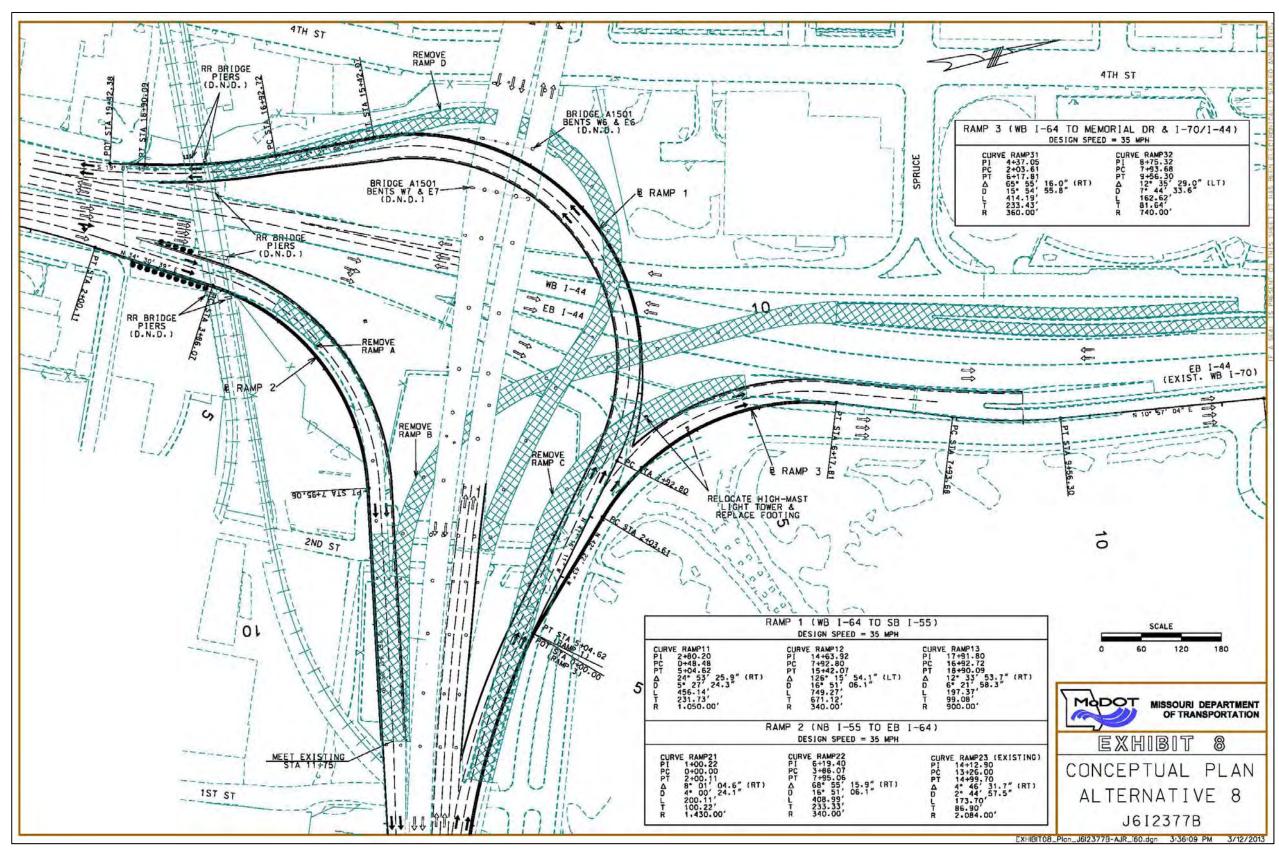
C: PSB Interchange Reconstruction Alternative 8, Sheet 3
